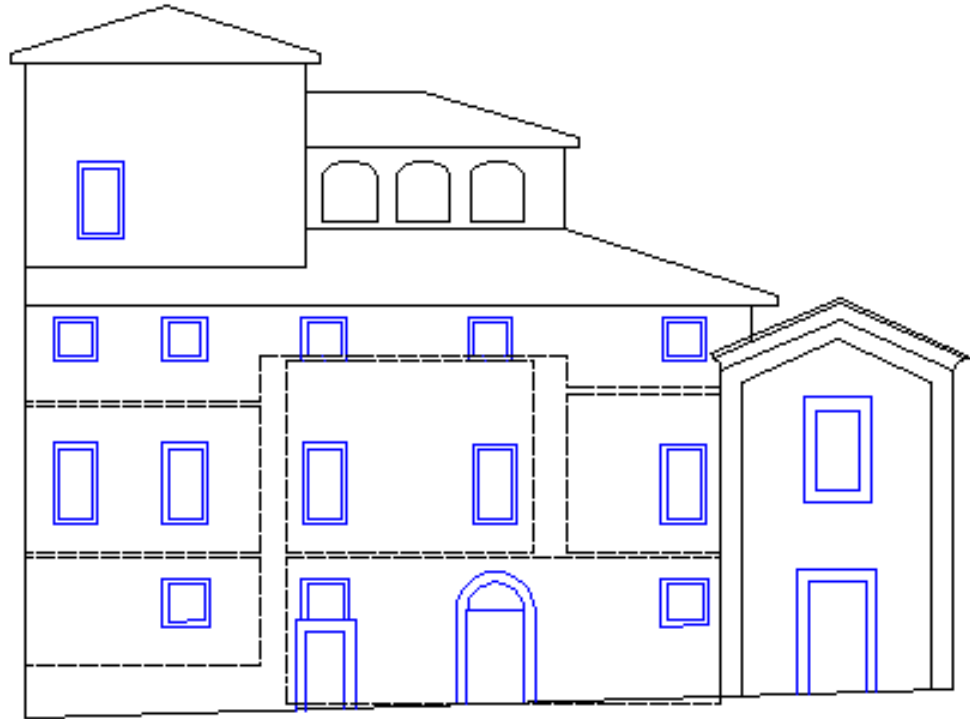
Use of photograph to orientate and define the façade reconstruction
